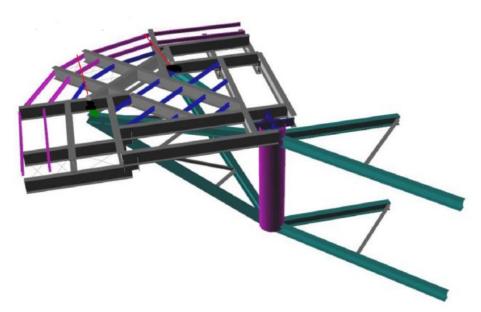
Detail of north east sail structure protecting the significant Western Extension.
